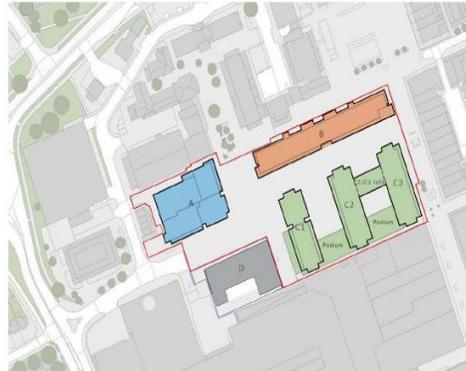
Extract from Submitted Design Code Outline Application demonstrating the layout of ground floor public and private realm areas of the proposals
